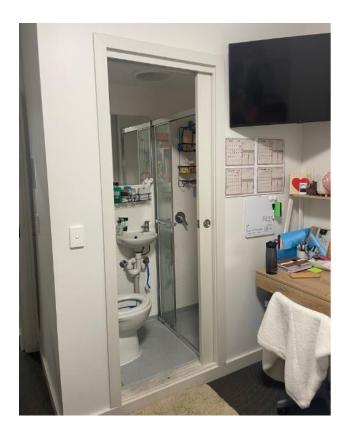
Room 5 with ensuite bathroom constructed without development consent
